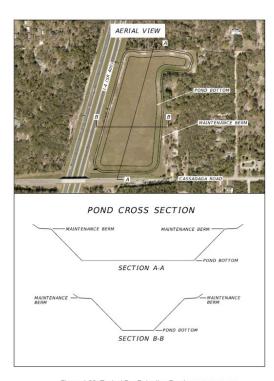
Typical Dry Retention Pond Return to List of Figures
